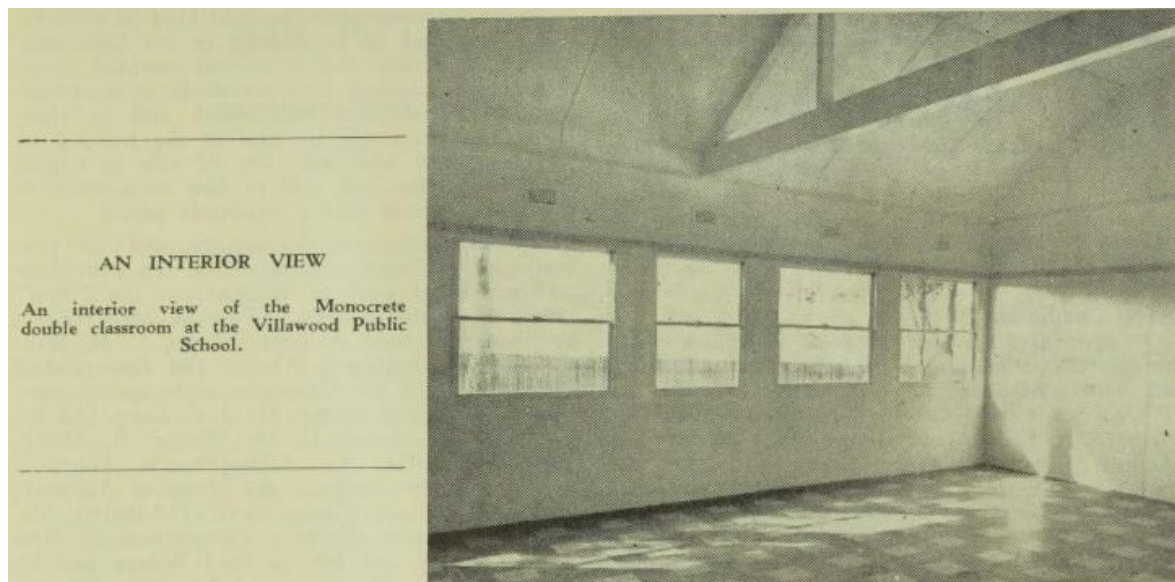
Interior of Similar Monocrete Classroom constructed at Villawood PS, 1950 (Source: Building and engineering 1950³⁹)
